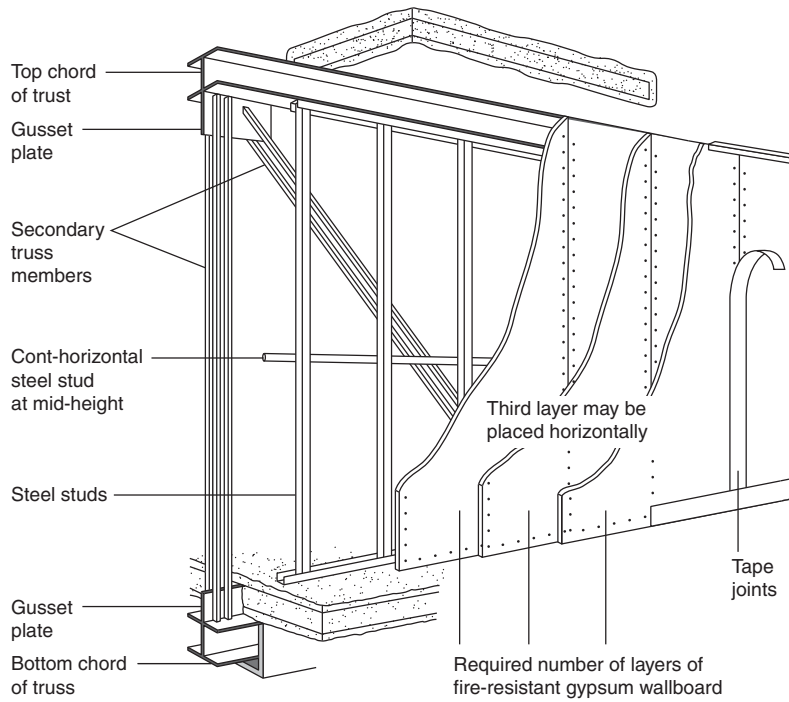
Staggered truss protection with envelope protection.³³
